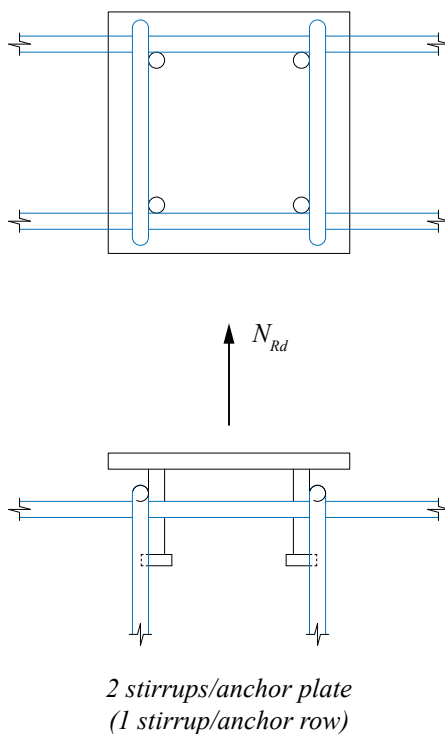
Supplementary hanger reinforcement alternatives for concrete cone reinforcement.
